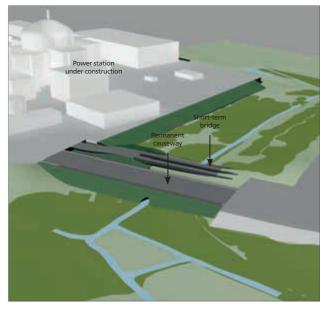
Option 4 - causeway over culvert with adjacent short-term bridge
